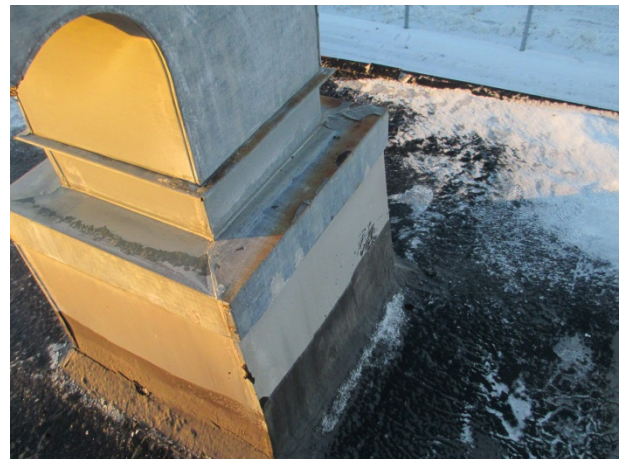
Wildwood Bldg 8 Main Roof - Mech Penetration & Curb from Boiler Room Below to be Removed
